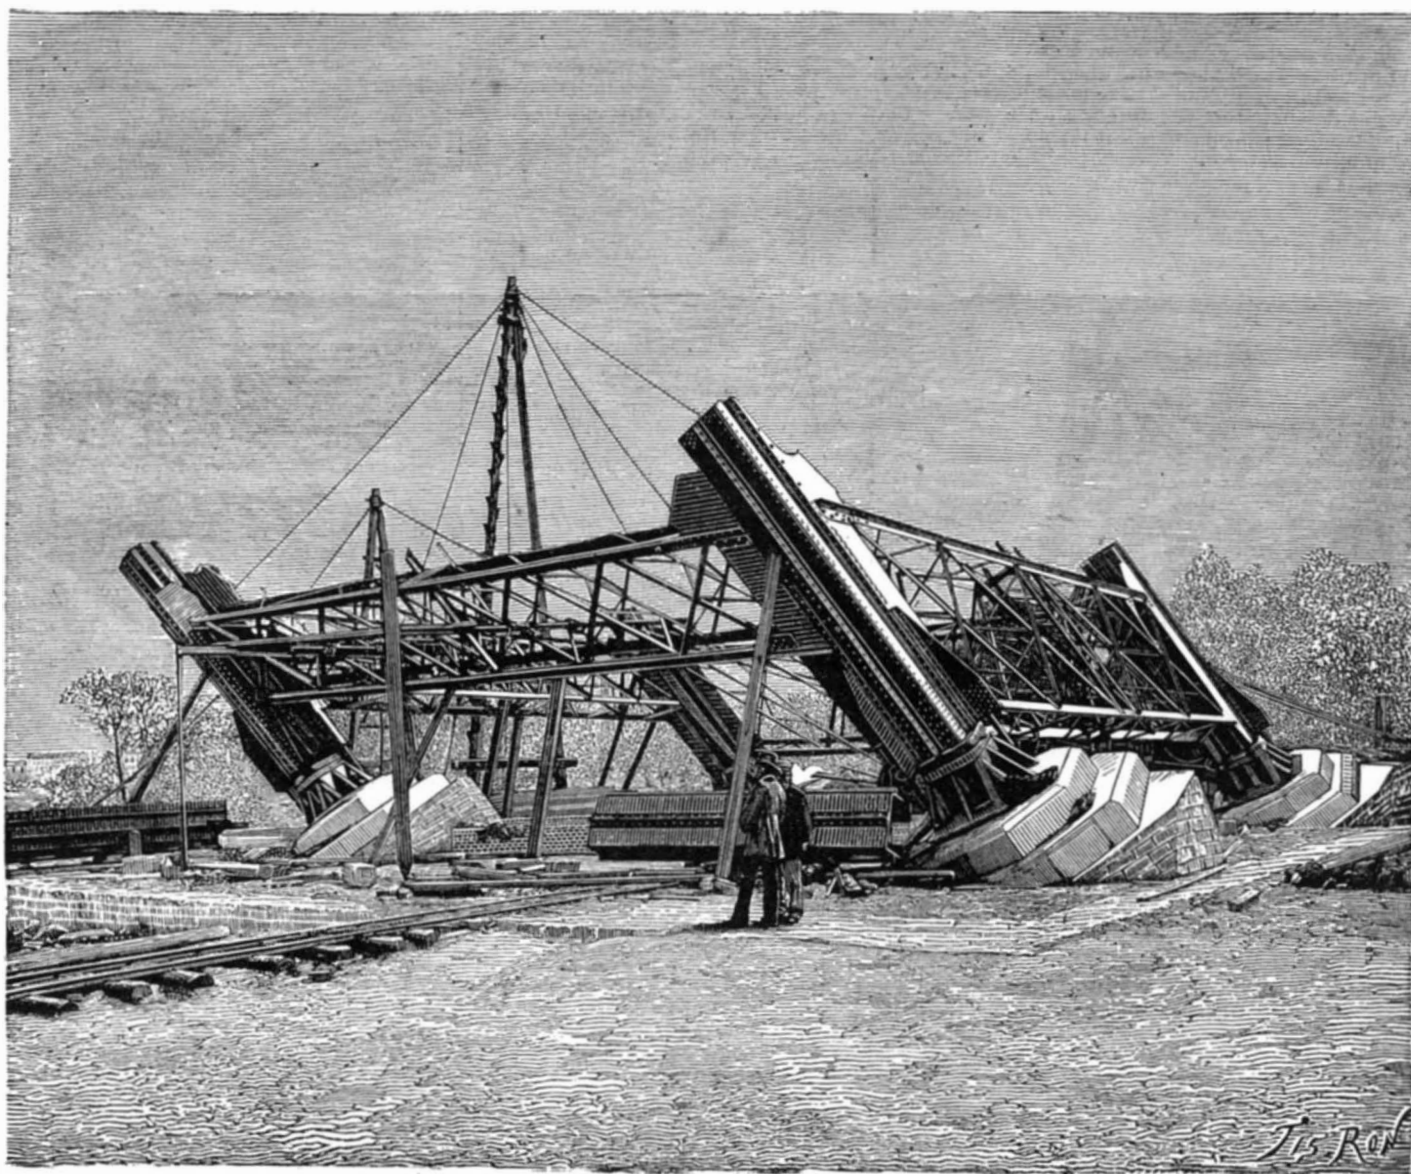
MOUNTING ONE OF THE TRUSSES OF THE 984 FOOT TOWER.
